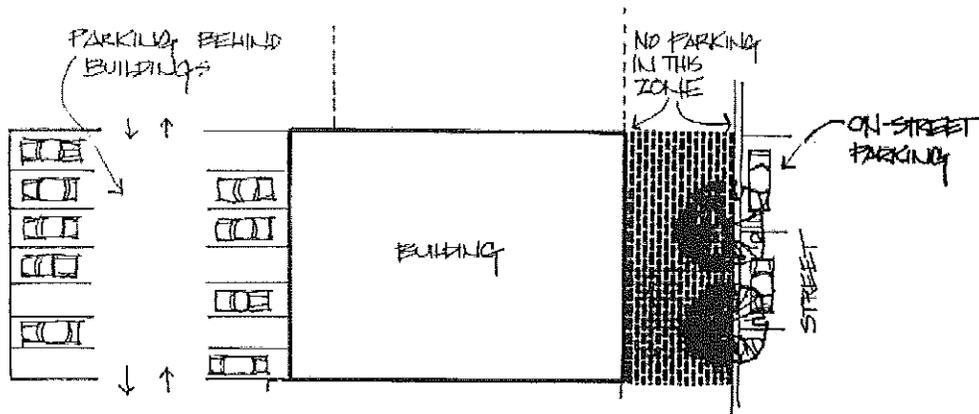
RECOMMENDED ON-SITE PARKING LOCATION
